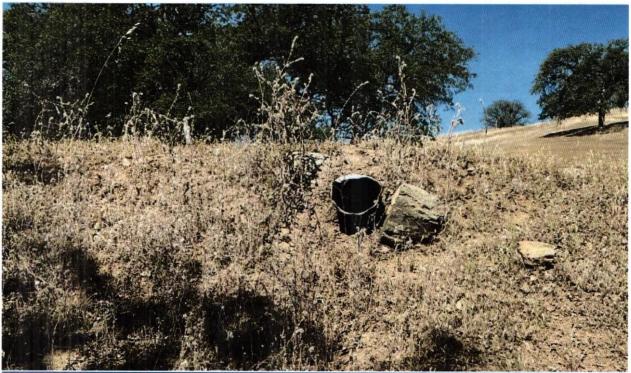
, Site ID "HAPt-1". Undersized, poorly aligned, and broken culvert serving as overflow pipes perched above the stream resulting in sediment erosion.
